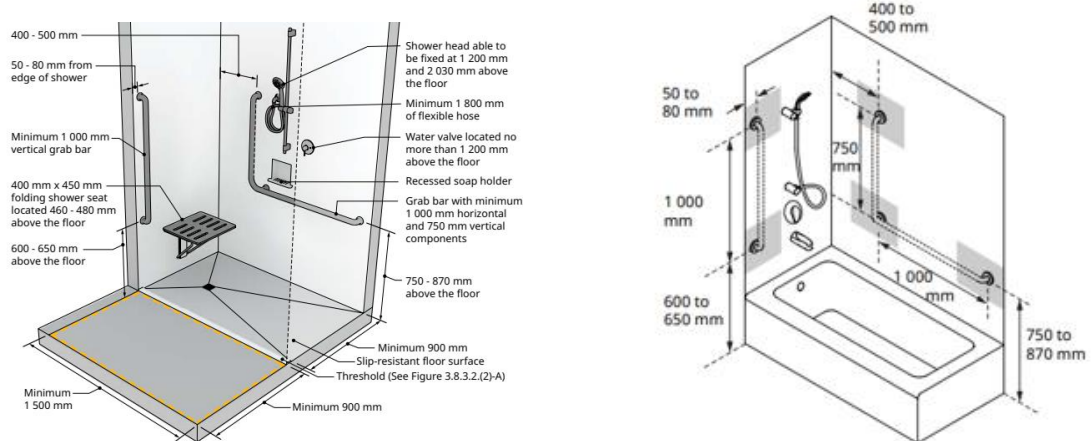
Accessible shower and acceptable grab bar layout of an adaptable dwelling unit bathtub
